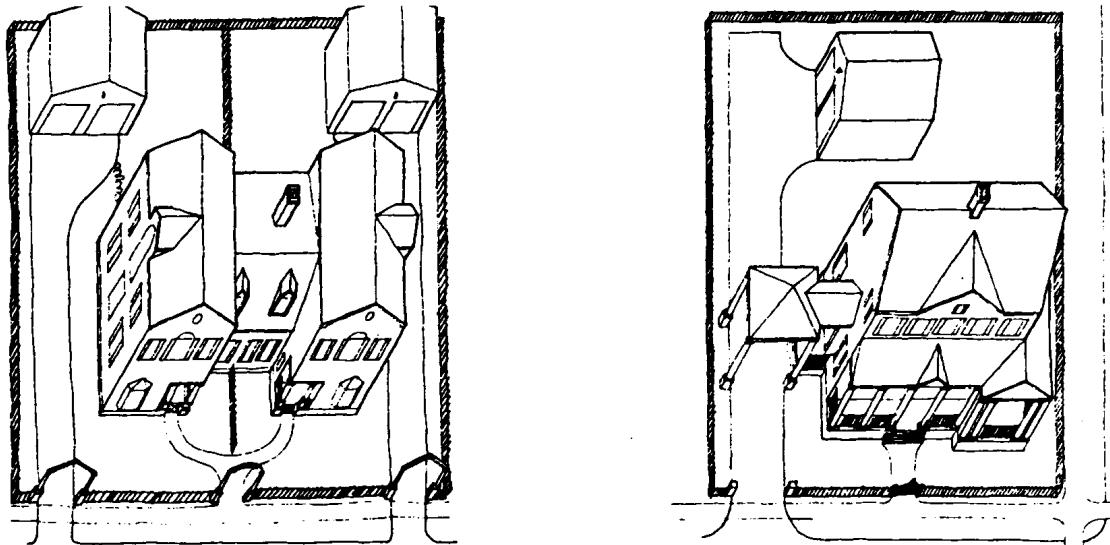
The front yard of fifty (50) percent of all dwelling units should be clearly defined by landscaping, hedging, fencing, or a brick or stone wall.
